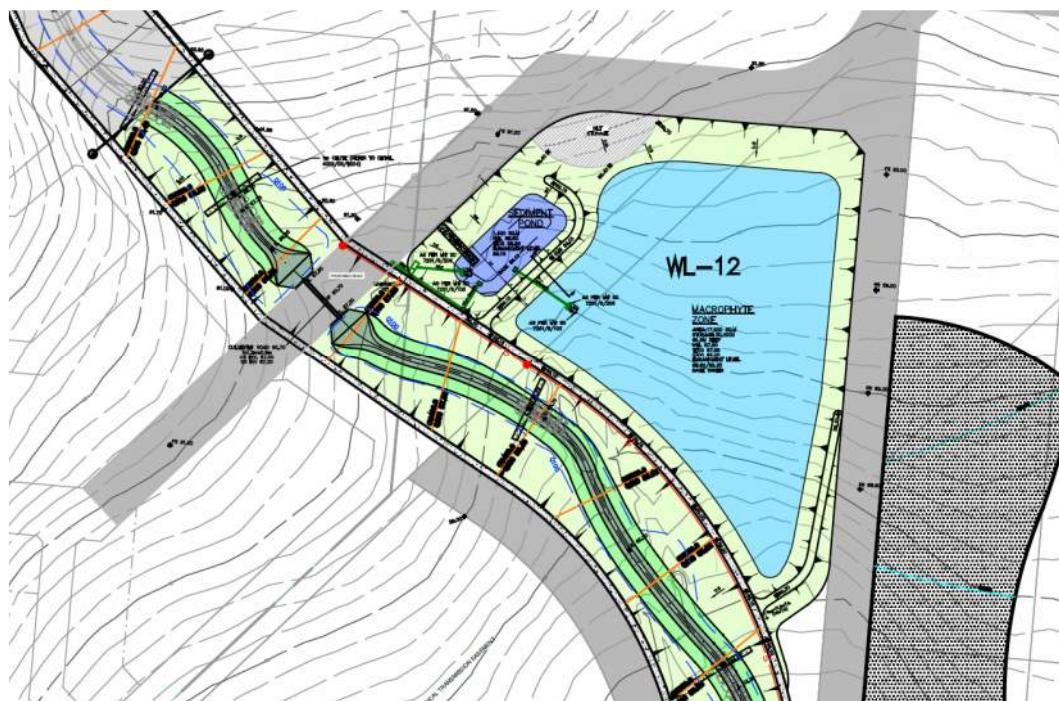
Proposed WL-12 Preliminary Layout (By DPM Consulting Group)
